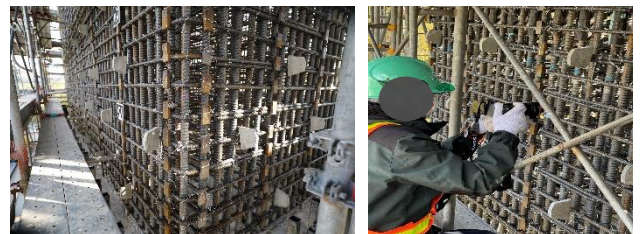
views of the rebars on-site (left), rebars photo shooting (left)
